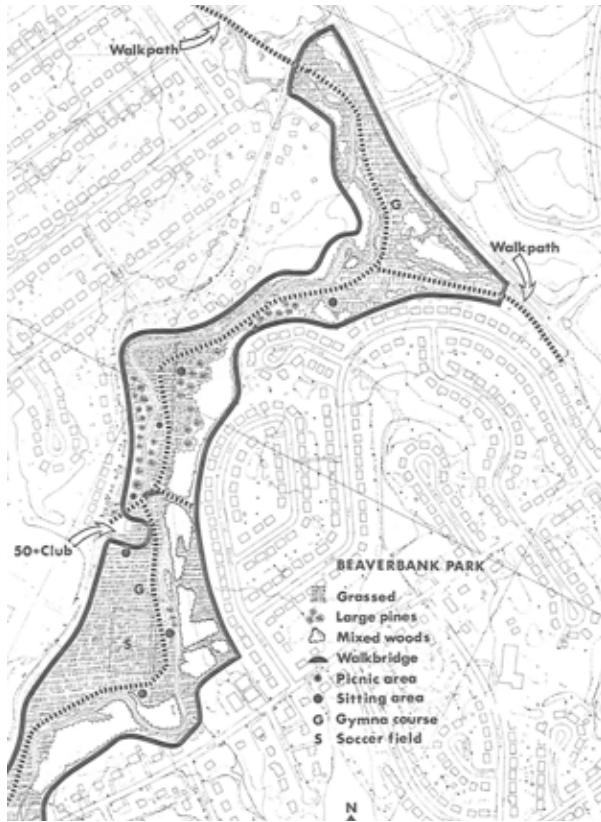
Site plan from the 1978 NSCAD study for a linear park along Old Beaver Bank Road. Despite ongoing development in the area, this area holds much potential as a centrally located, accessible park and recreation area.
